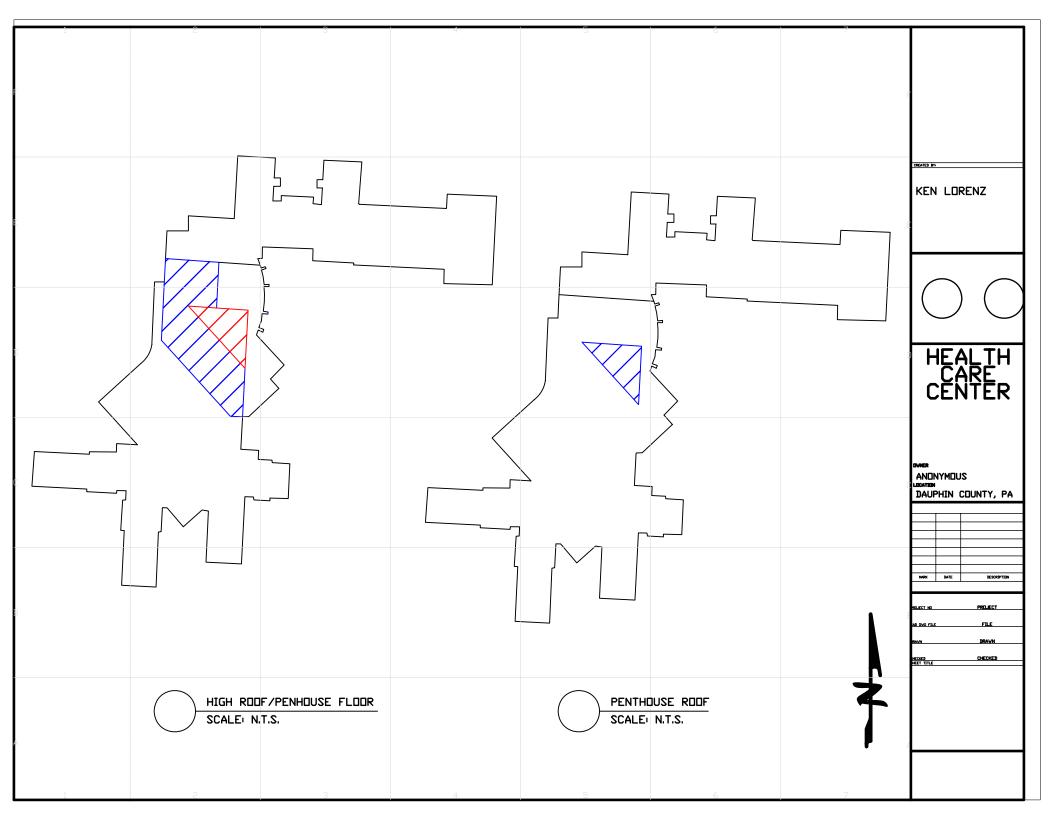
DETAILED STRUCTURAL ESTIMATE High Roof / Penthouse Floor
